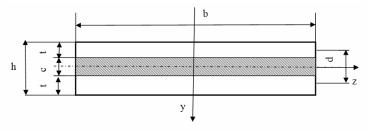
Structural sandwich consisting of two face sheets and a continuous core (Bejan *et al.*, 2006).
